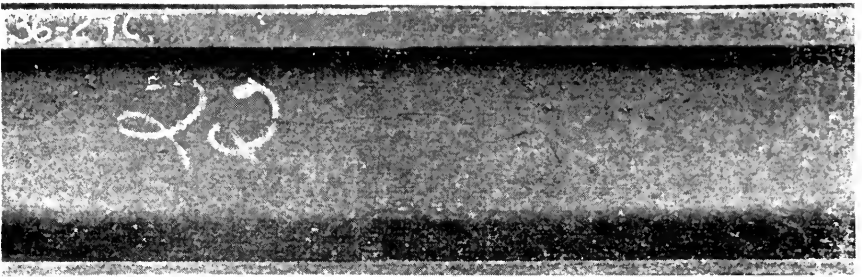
(Investigation 136-27, Sample C)—Side view of a failed electric flash butt welded rail joint. This fracture started at the weld and progressed in a horizontal plane along the neutral axis. The rail on the left side of the weld is the west rail. The adjoining rail on the right side of this weld is the east rail.
